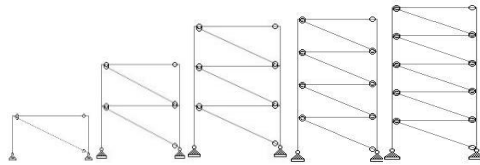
Hinged Base, Shear Connected Columns and Beams with Diagonal Brace Single bay system
